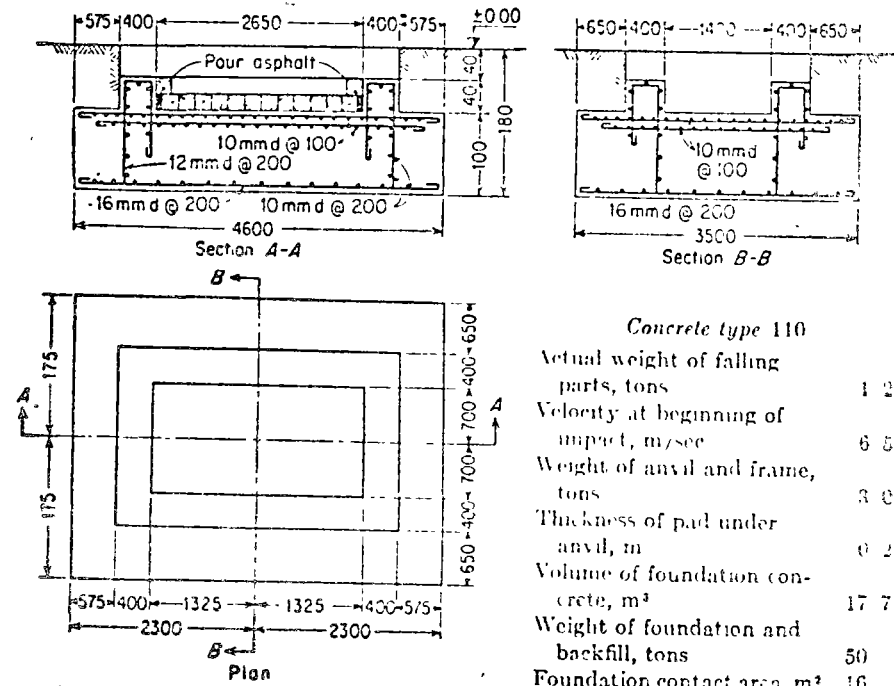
Foundation for 12-ton steam or compressed-air stamping hammer
